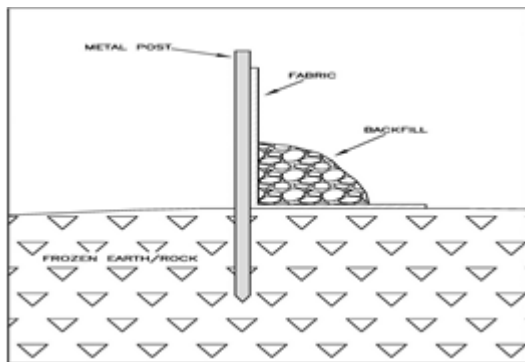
Properly Constructed Silt Fence for Frozen Earth or Rock
